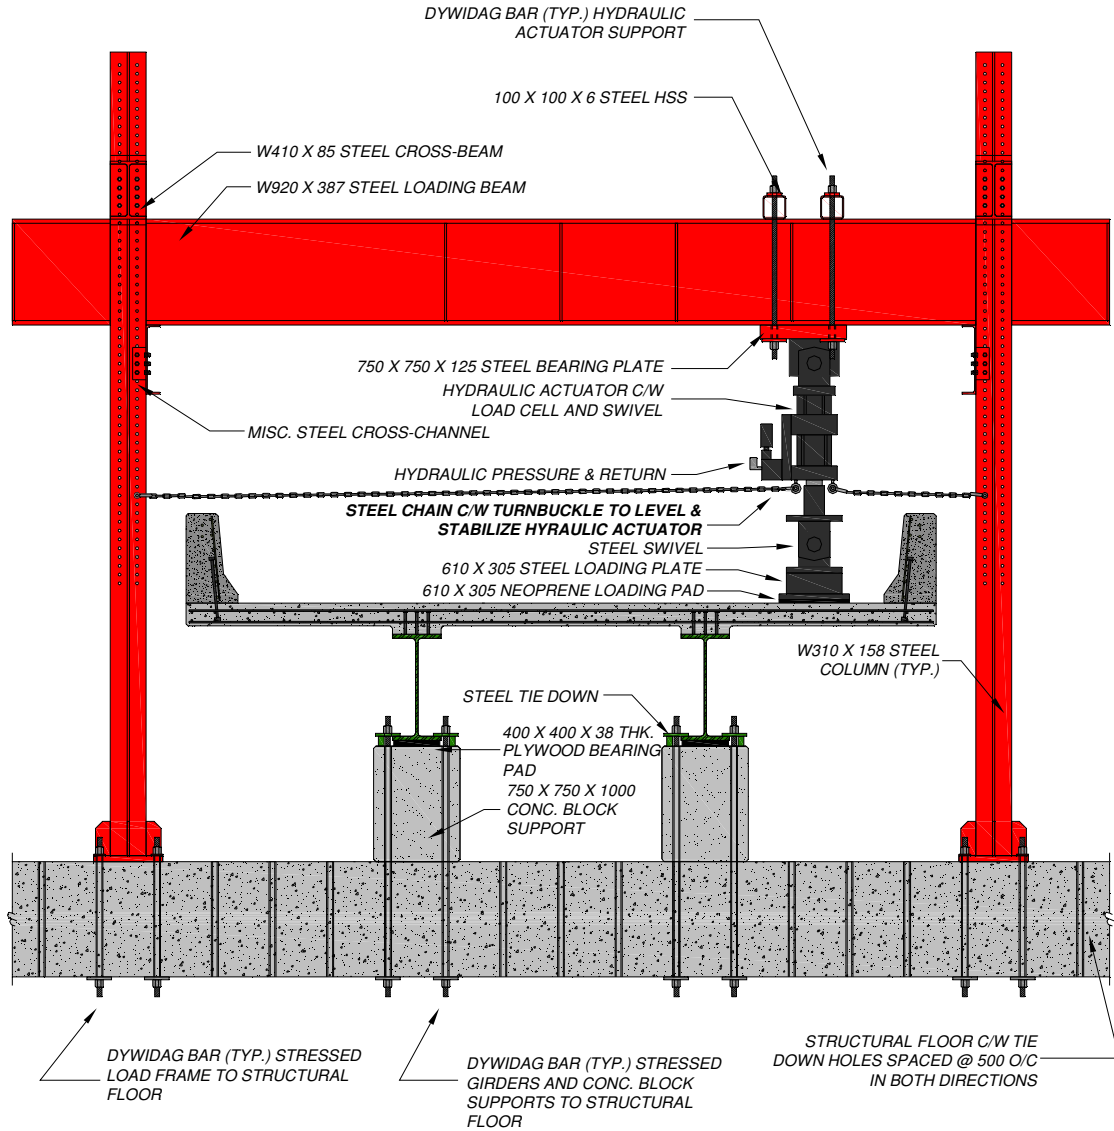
(b): Typical cross-section of full-scale test set-up illustrating superstructure support and load frame
